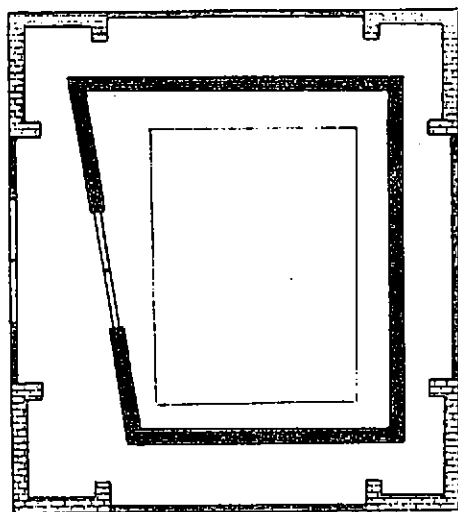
PLAN OF LOWER ROOM IN THE VERTICAL TRANSMISSION SUITE.
